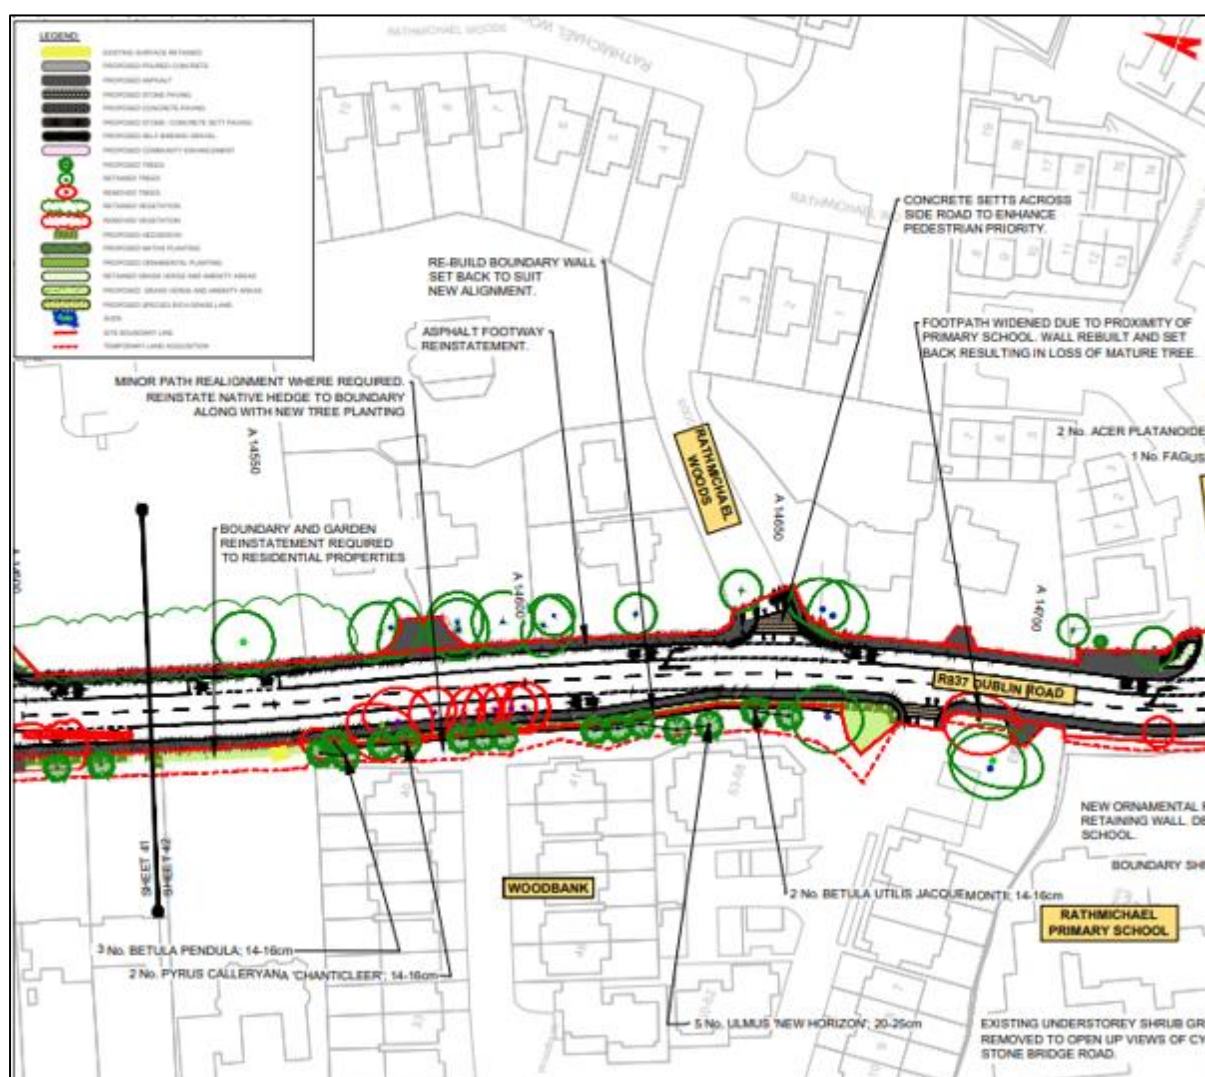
Extract from Landscaping General Arrangement Drawings at Woodbank (Sheet 42)
